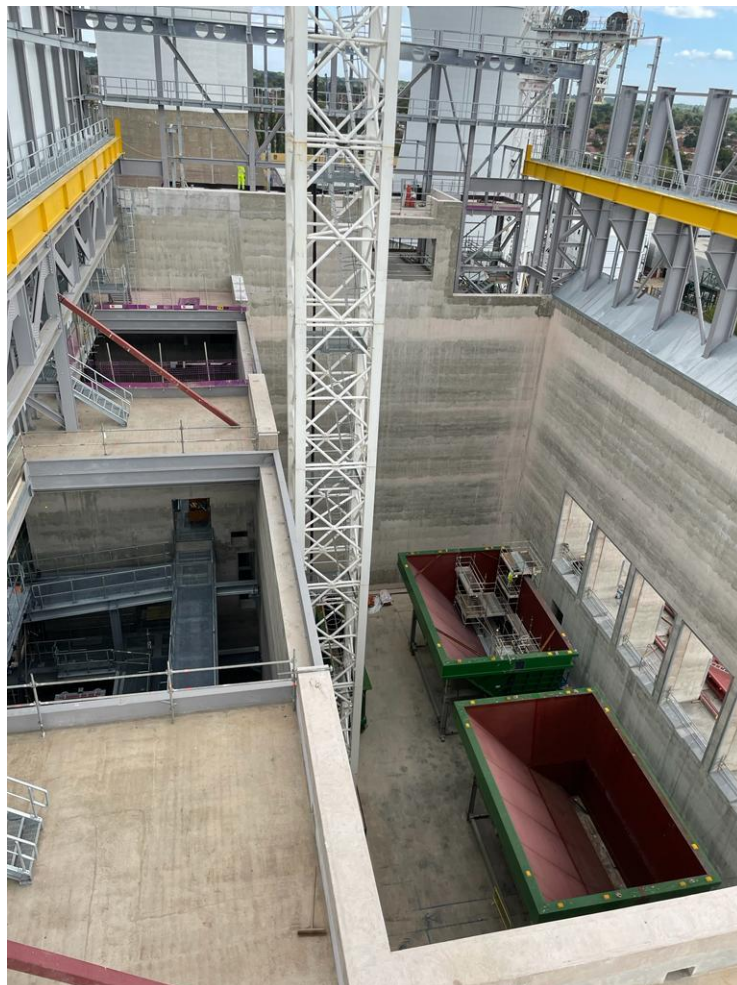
Feed Hopper Openings Consented Development Construction Works (August 2022)
